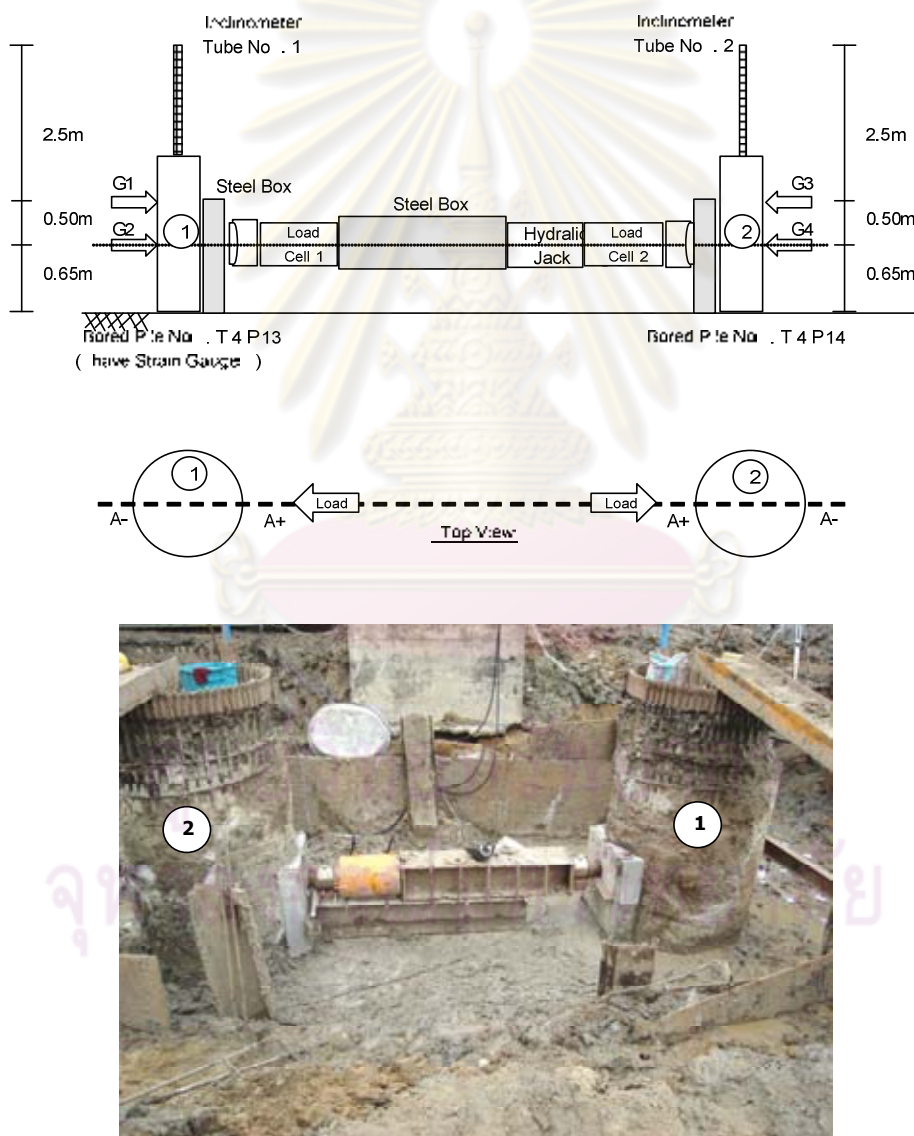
Layout for static lateral load test on bored pile with loading frame
